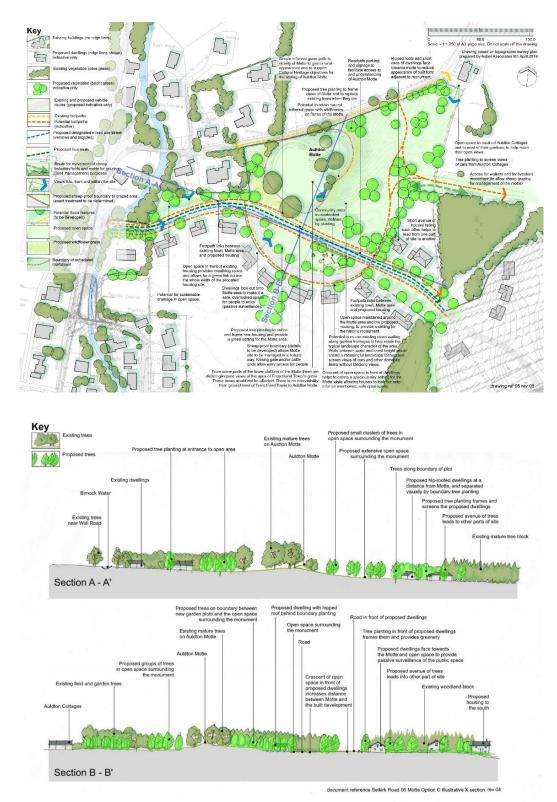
An illustrative plan and cross sections for the northern part of the site has been prepared to indicate how the masterplan guidelines and design principles could be applied here. Note, this plan is indicative only, and subject to development and refinement at detailed design stage.
